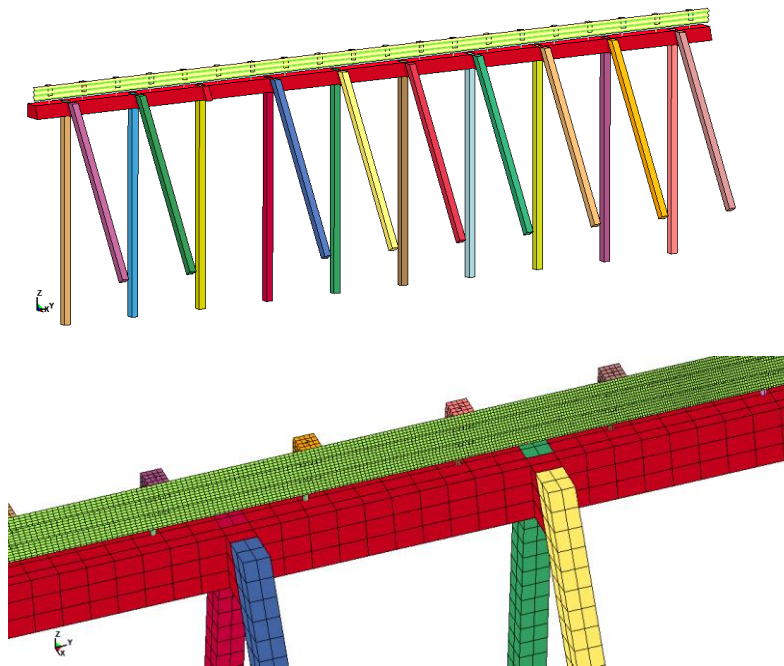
Finite element discretizations for micropile A-frame, guardrail, posts and grade beam
